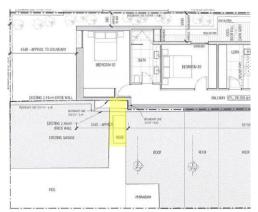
Location of walkway shown in yellow (Applicant submission – advertised plans)
